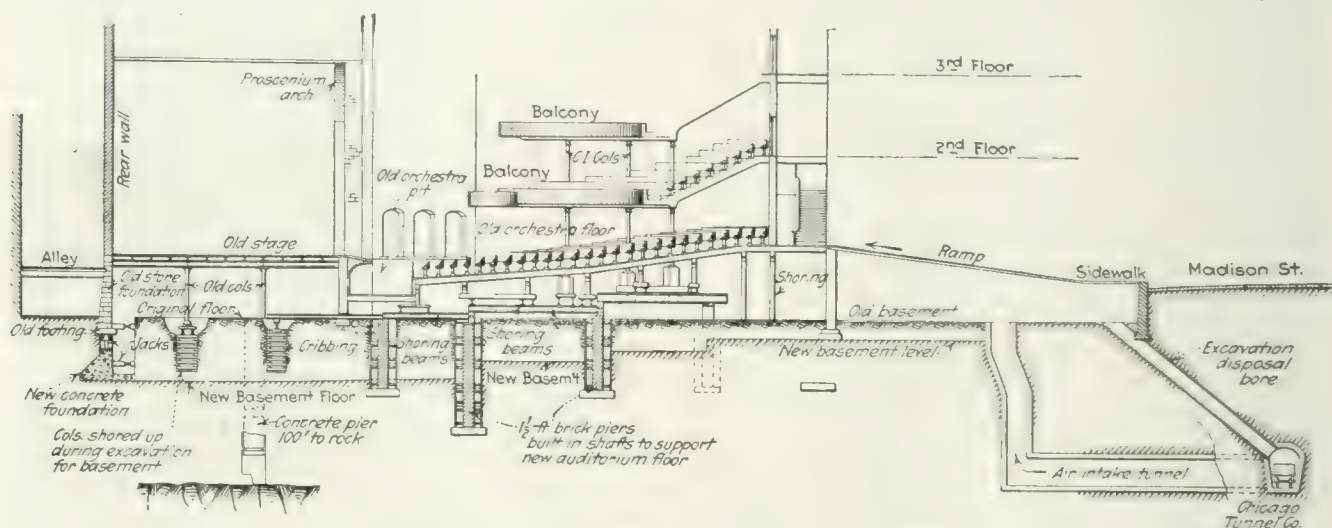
NEW FOUNDATIONS PLACED UNDER THEATER AT CHICAGO, PRELIMINARY TO RECONSTRUCTION
